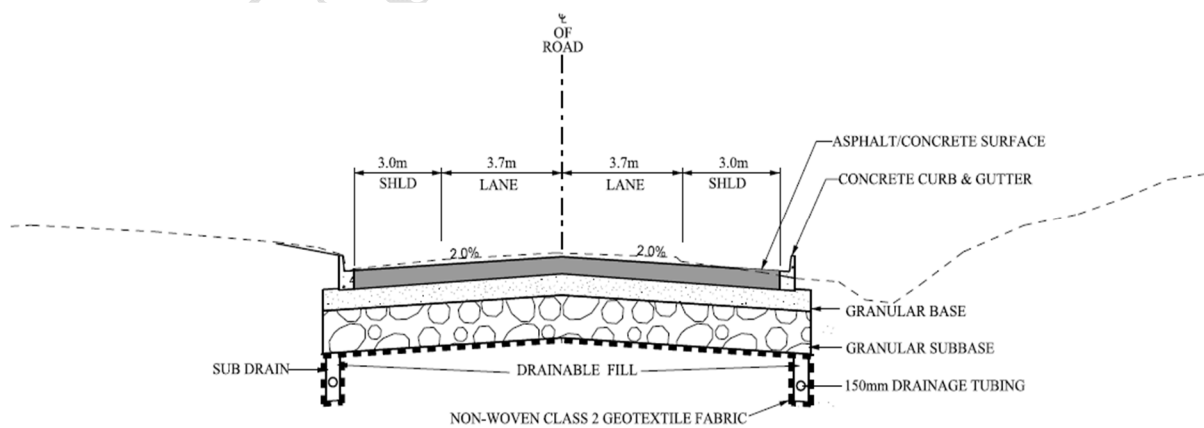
Typical x-Section and Subsurface French Drain Installed under Curb and Gutter of Urban Highways/Roads
